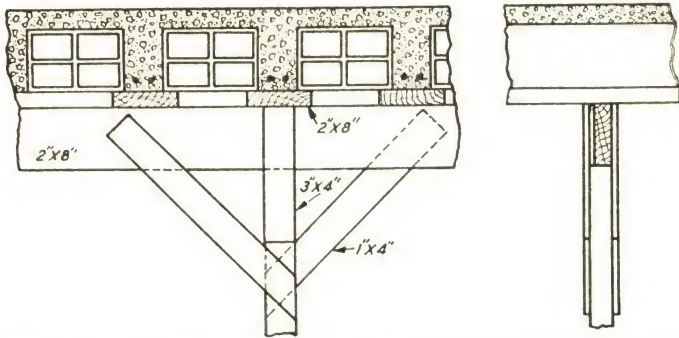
Forms for Reinforced Concrete Joists and Terra Cotta Tile Construction
